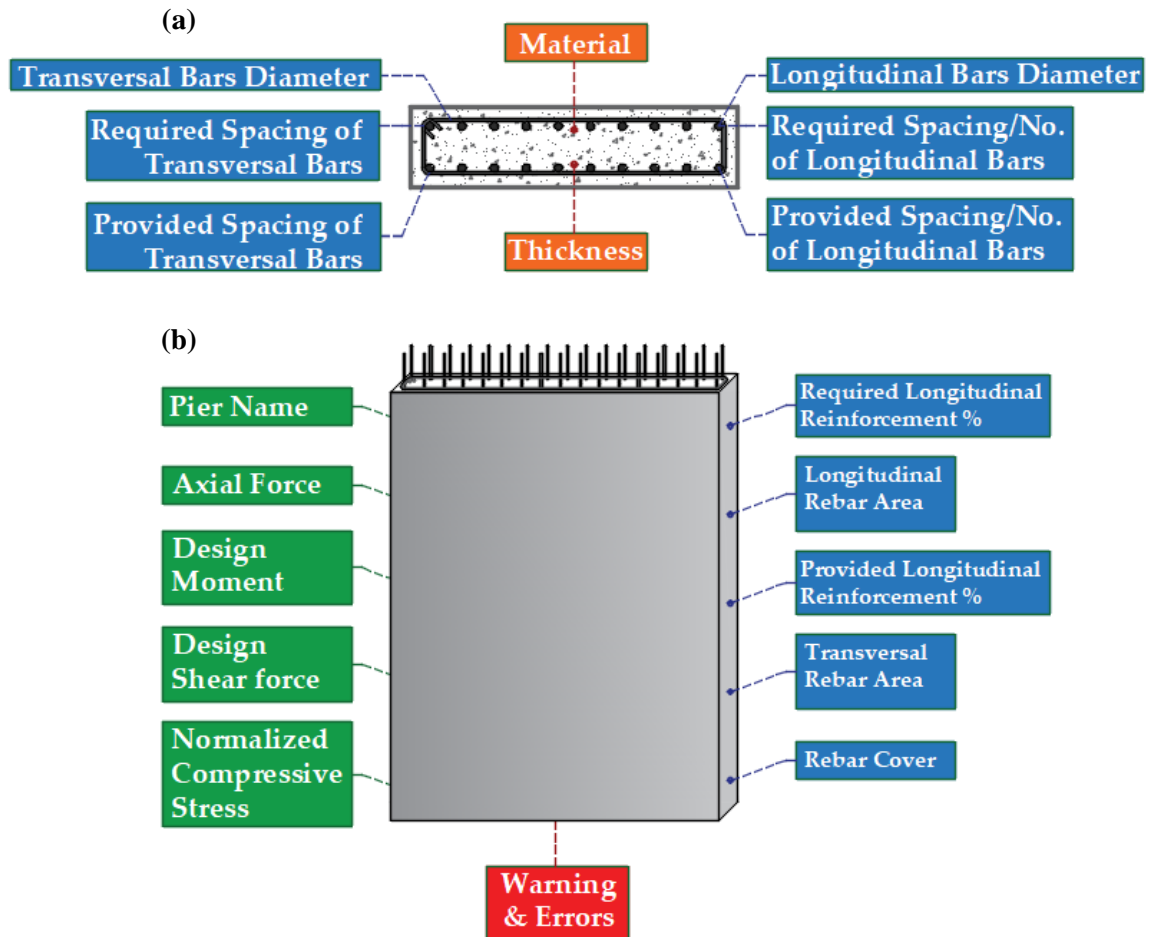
Some pier wall parameters (a) Section view (b) Elevation view
